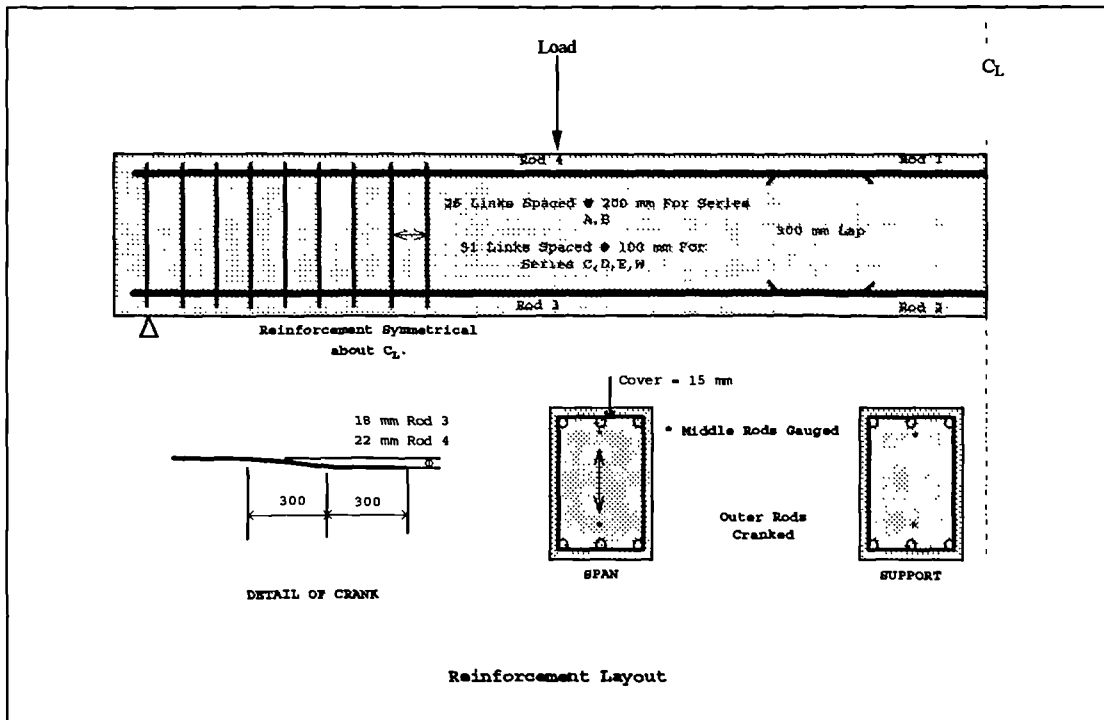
Longitudinal reinforcement layout for the test beams.
